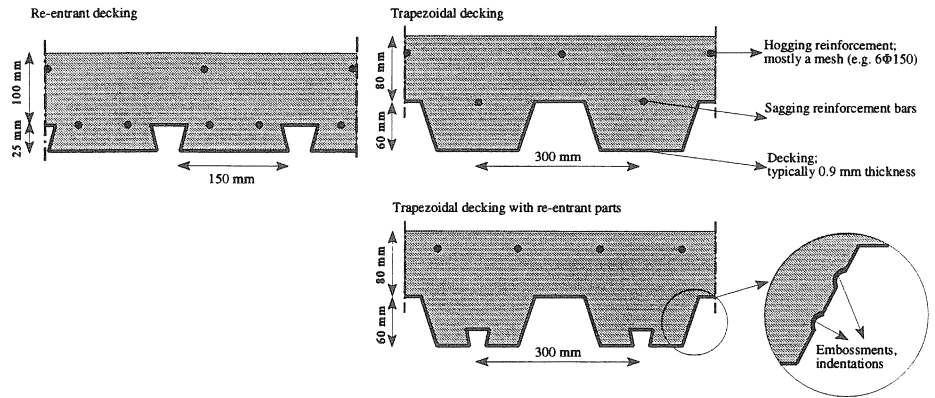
Typical cross sections of composite slabs; indentations provide composite action.
